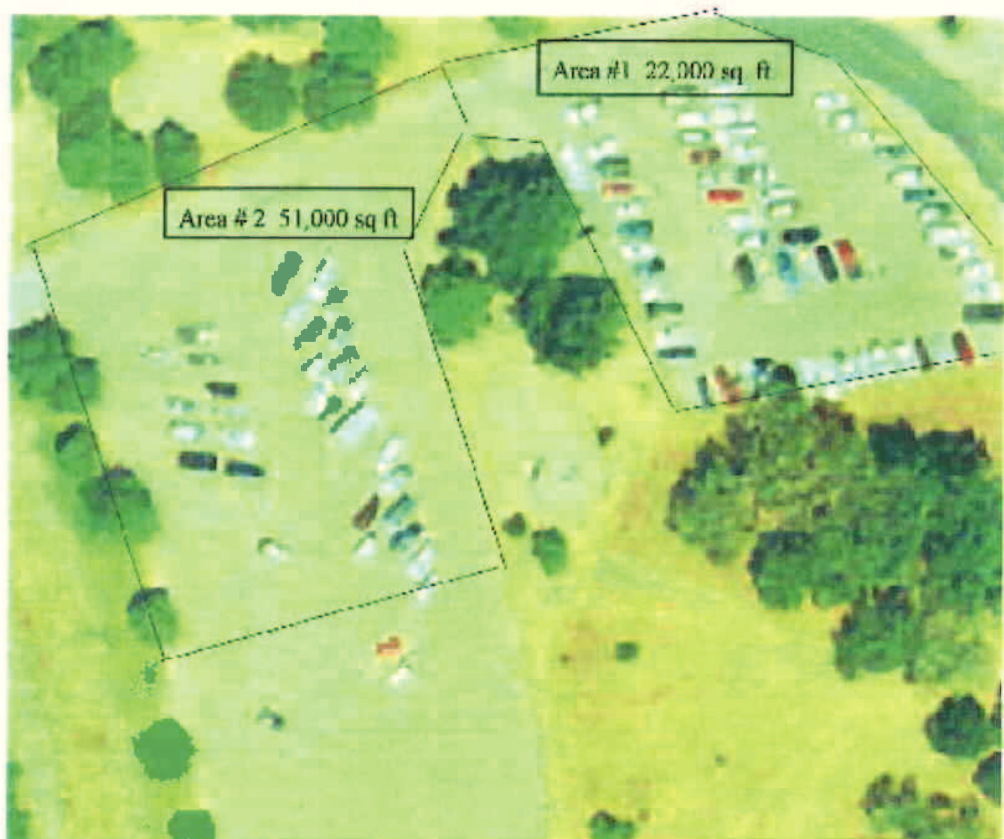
Outlined indicates area of proposed Guard Top resurfacing, and parking lot striping.
